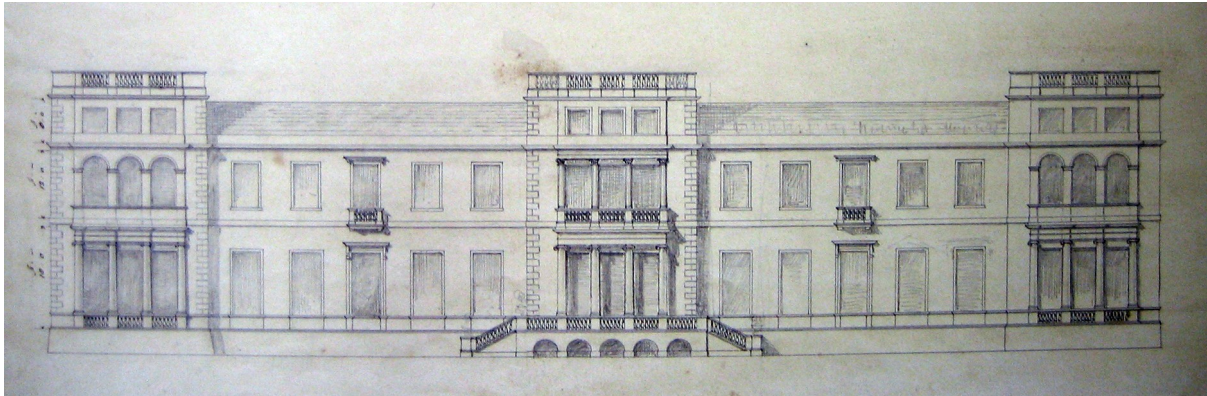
Shaw's elevation drawing. 1818. L33/146-147. BARS
